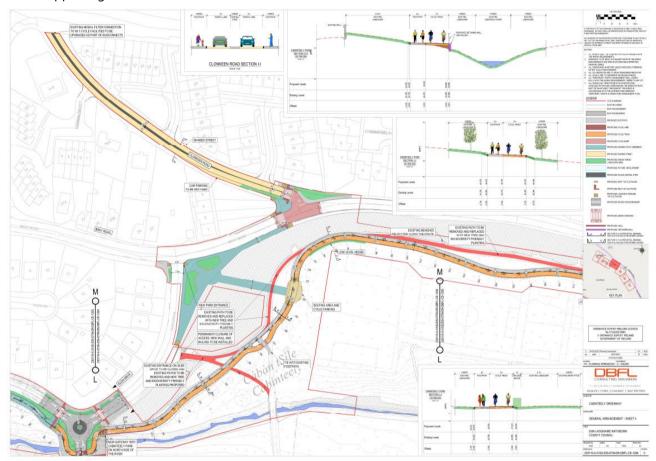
Proposed Section C(1) of Cabinteely Greenway (Source: DBFL Consulting Engineers)
